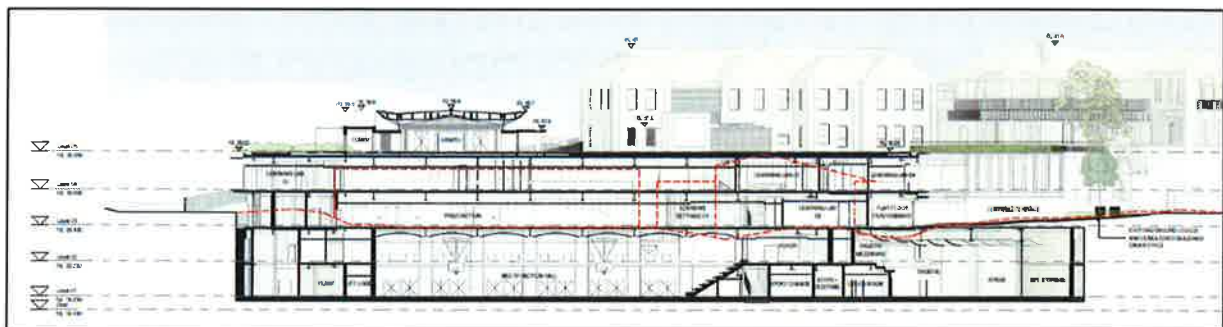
| Cross sectional looking southwards from Hordern Oval (Source: Applicant's RtS 2019).
